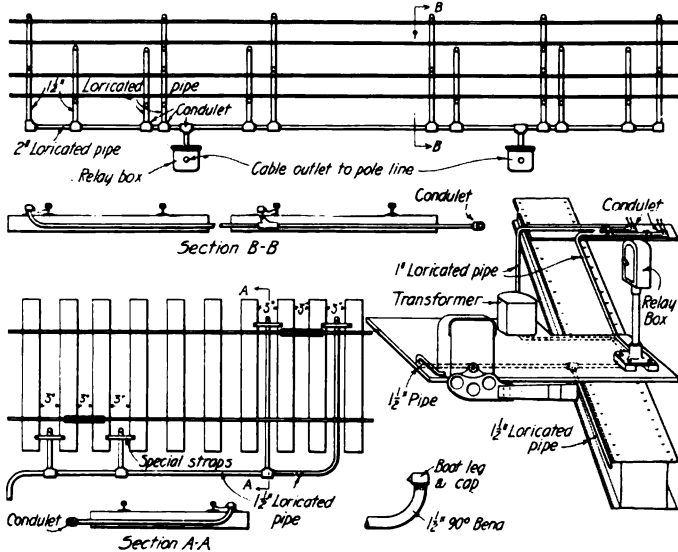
Arrangement for Installing Conduit and Bootleg on Bridge.
